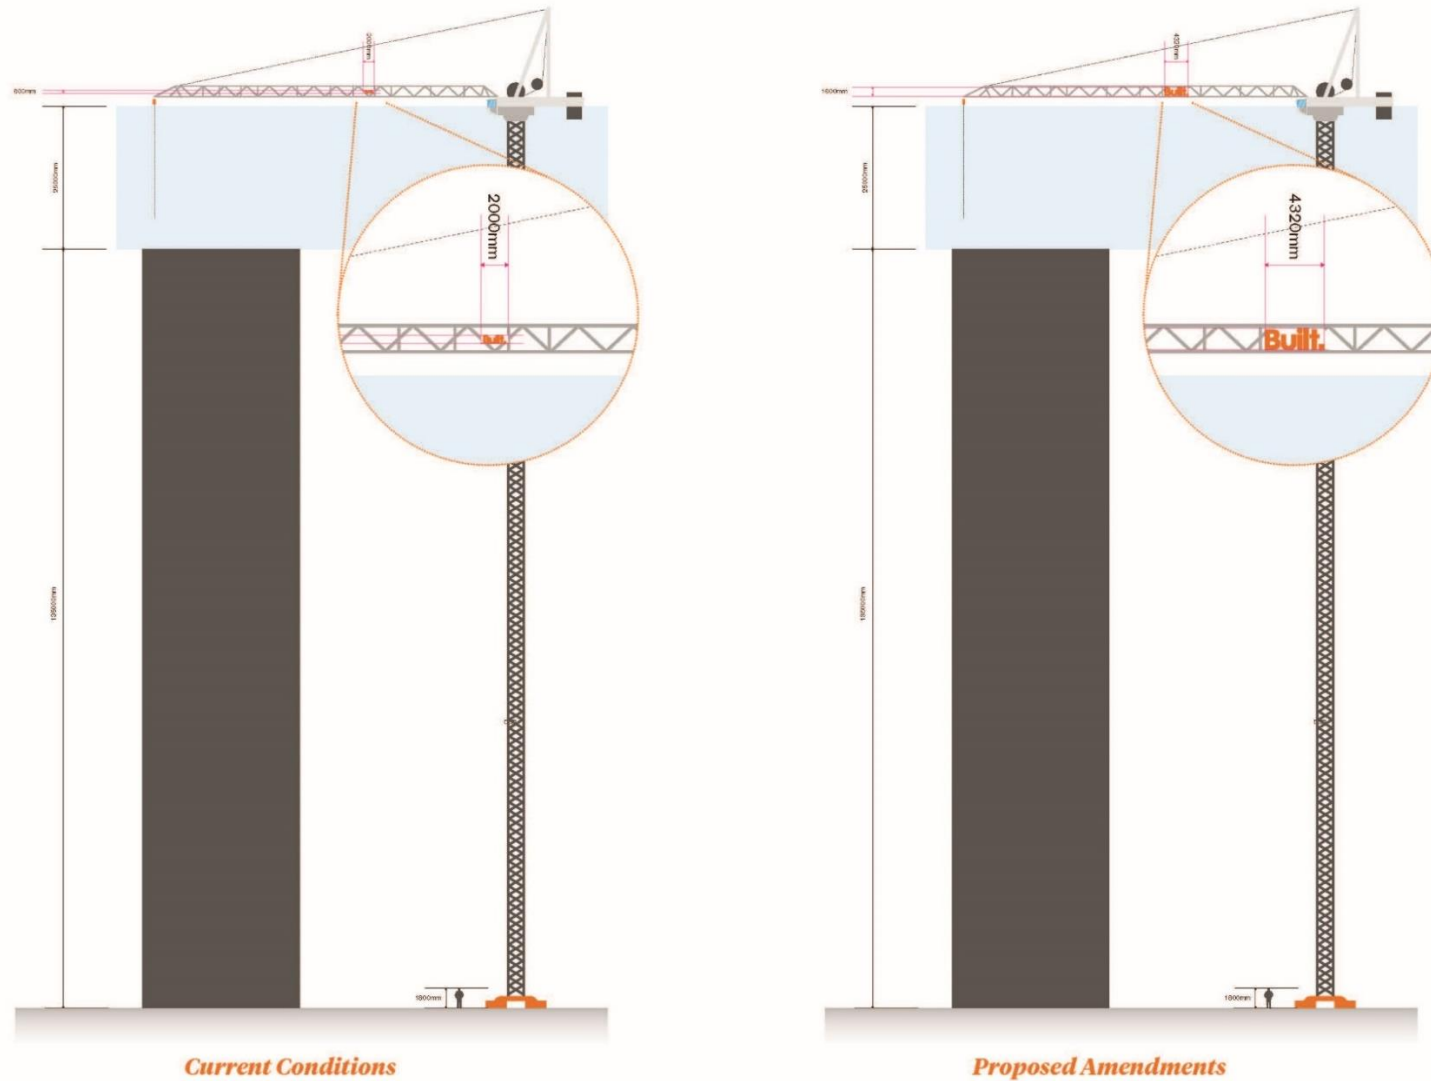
Scale representation of crane signage size for 135m tall building (4 Parramatta Square) under Current Conditions (left) and Proposed Amendments (right)
